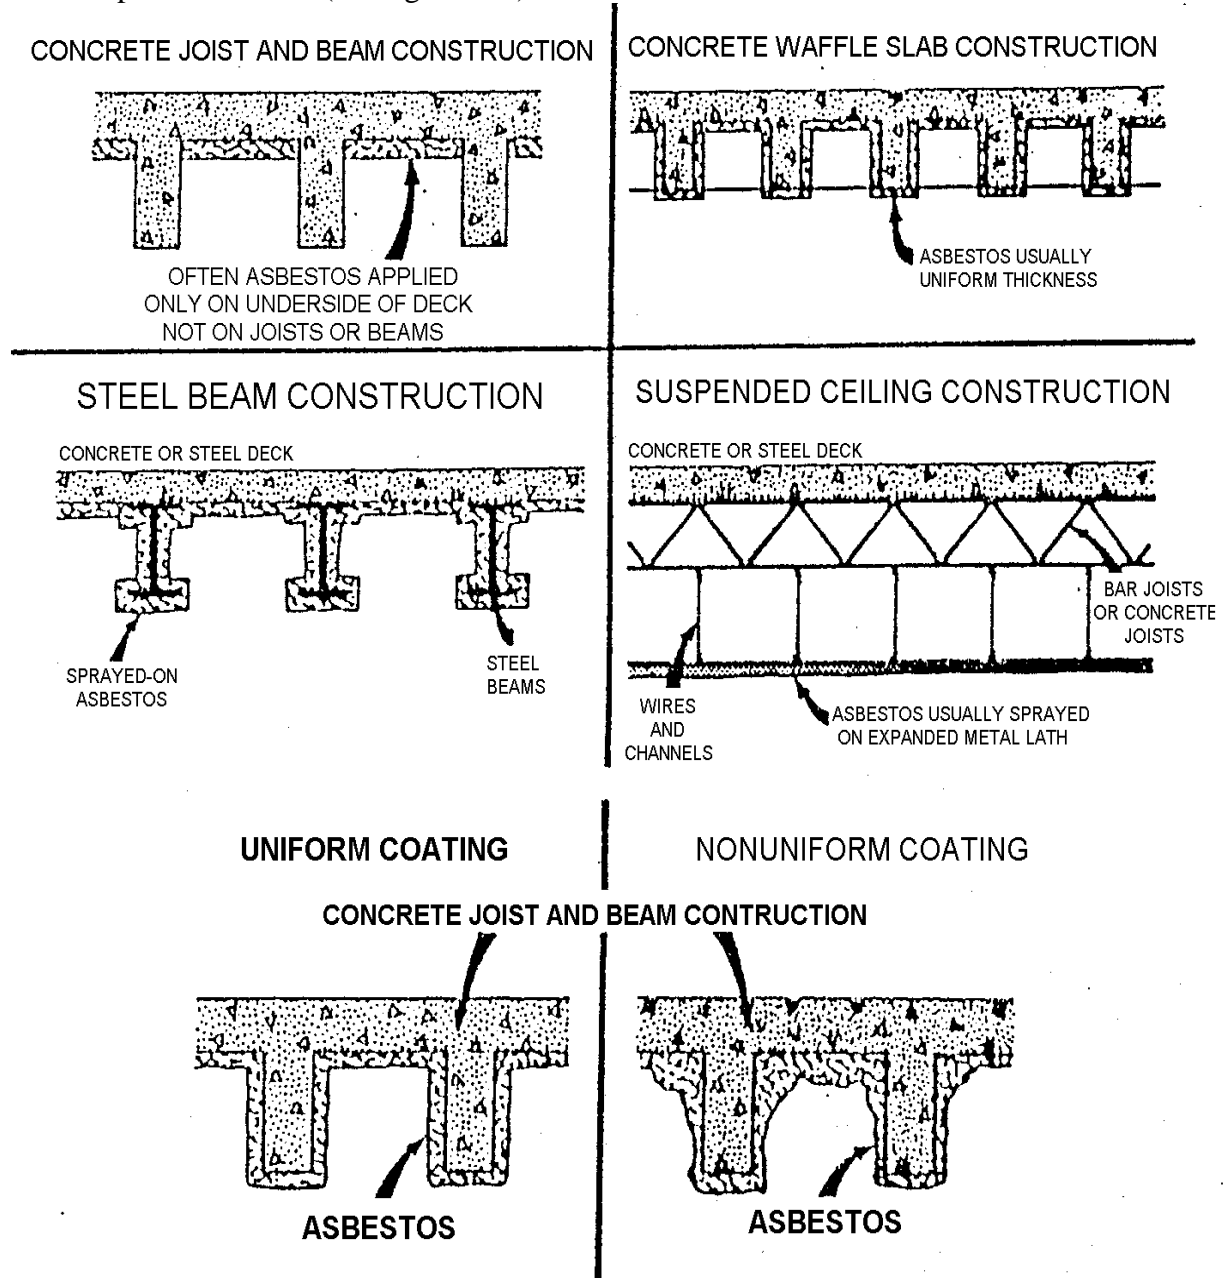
Sprayed-on Asbestos-Containing Fireproofing on Joist and Beam, and Concrete Waffle Slab Construction.
